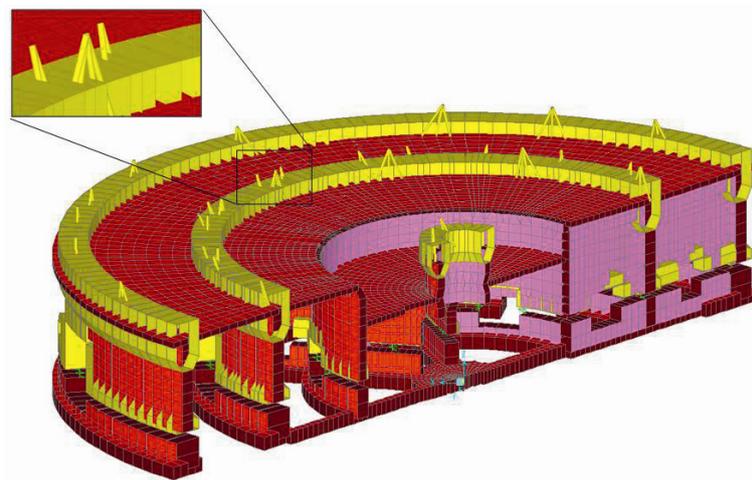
Finite element model of the telescope foundations and detail of the telescope foundations.
